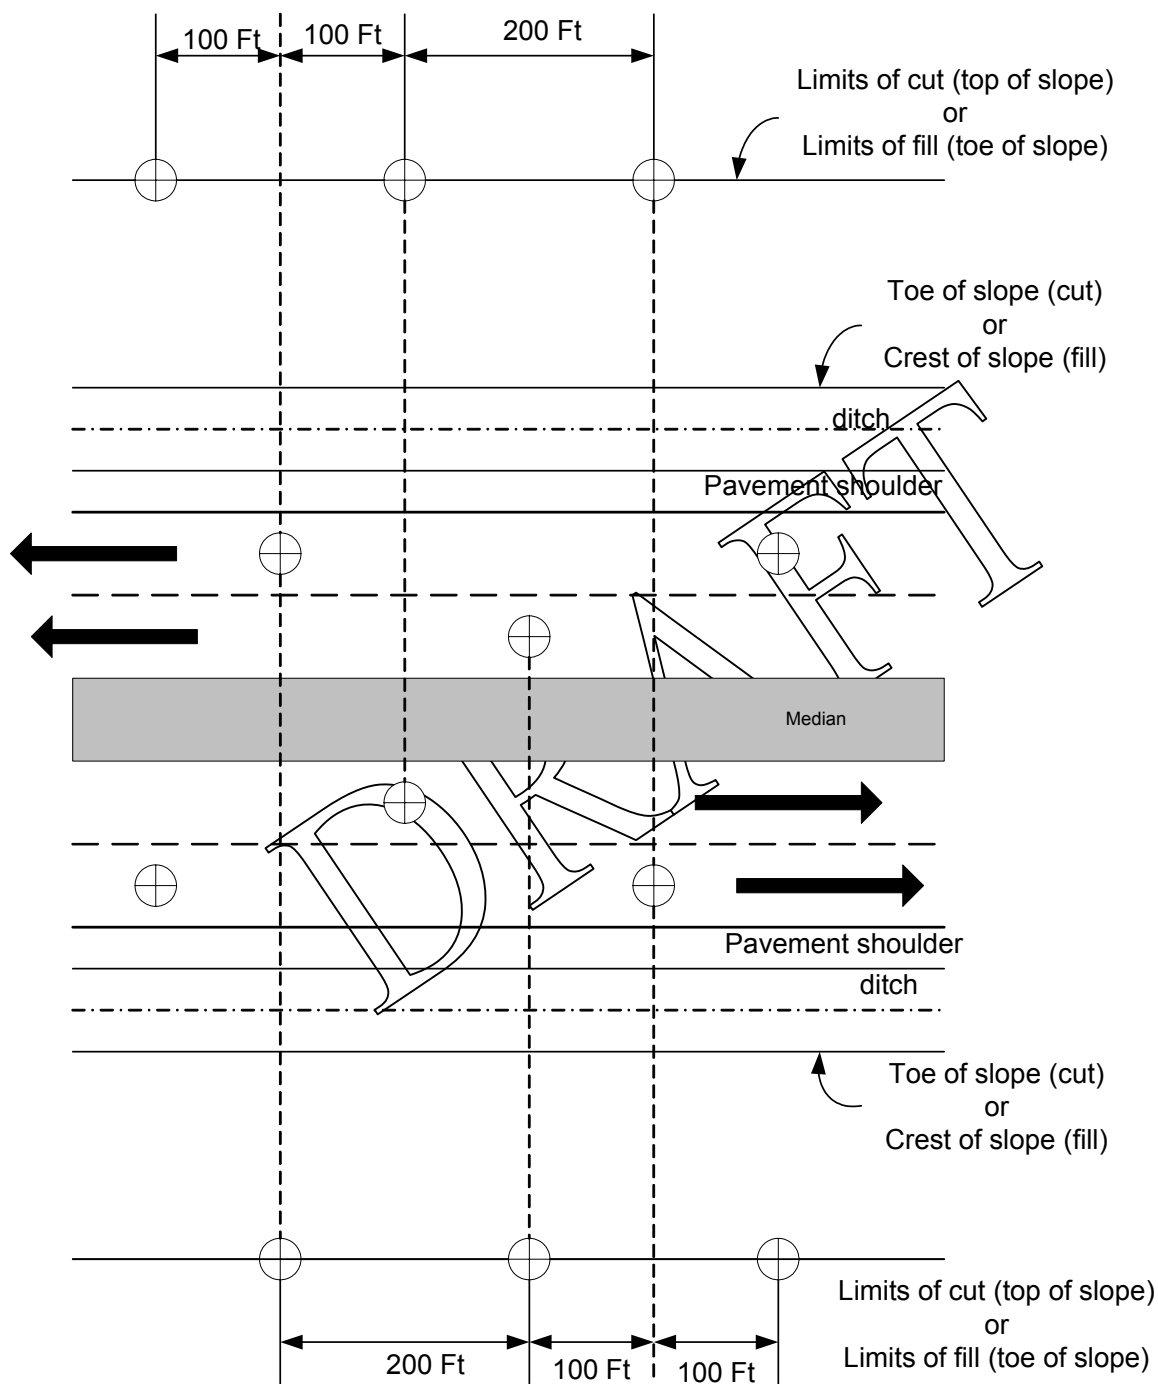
Boring Layout for a Four (4) Lane Divided Road with Cut or Fill Slopes Equal to or Greater than 15 ft High or Areas Where Rock Excavation is Expected to be Encountered above the Planned Depths of Excavation
